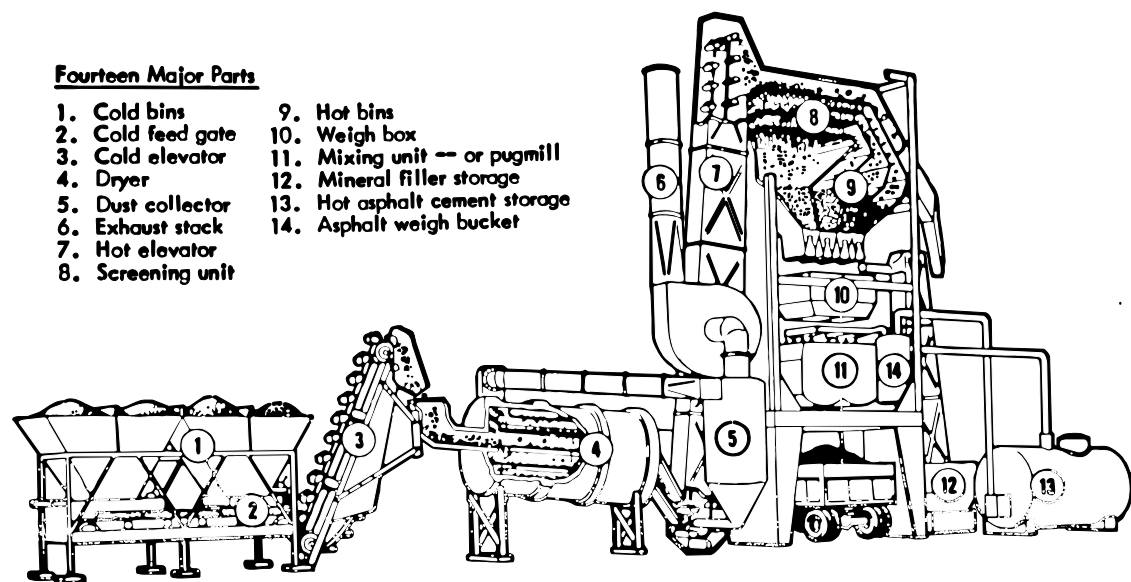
Batch asphalt concrete plant (Asphalt Institute 1986).
